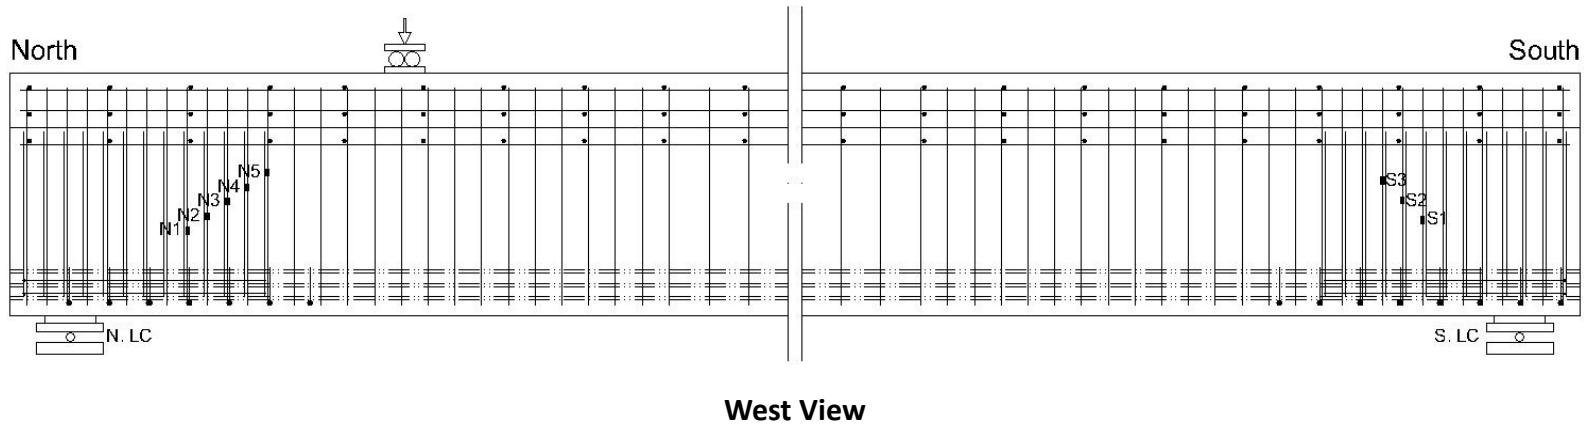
Layout of Strain Gauges on Transverse Reinforcement for Girder G1-North End Testing (Labib 2012)
